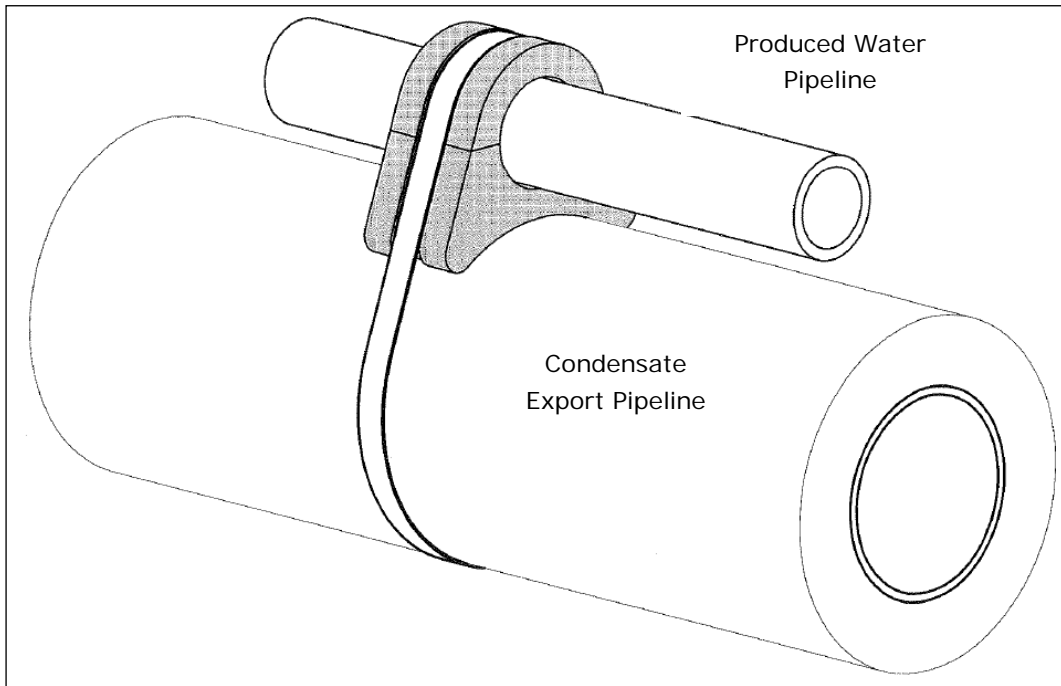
Piggyback Block and Strap Clamping Arrangement
